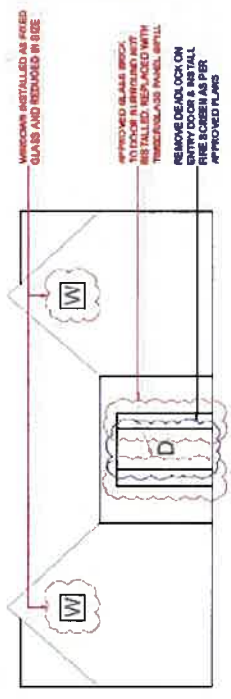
A1: UNIT BLOCK C - EAST ELEVATION
